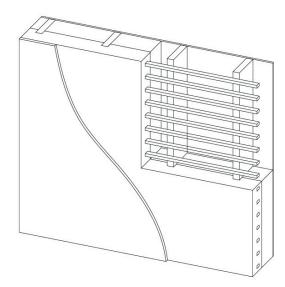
Haus J, structure of external wall. From outside to inside: External lime render, straw light earth on battens (12 cm spacing), structural timber frame, studs 6×18 cm, cellulose blow-in insulation, stiffening gypsum fibreboard
